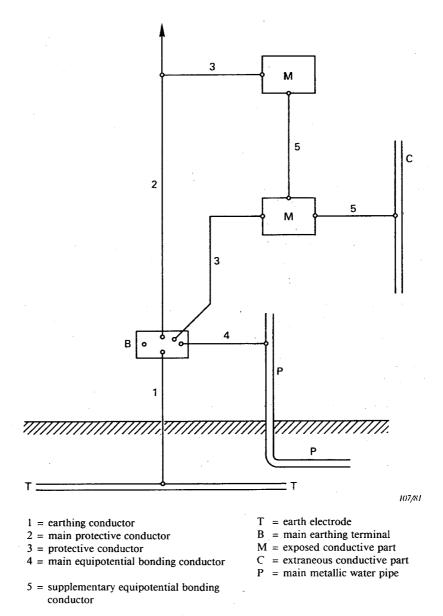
Illustration of the elements of a typical earthing arrangement.
